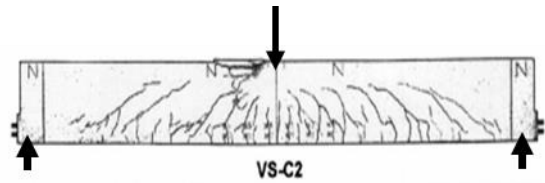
Crack pattern on beam with shear reinforcement and Shear span to depth ratio of 5.8.
